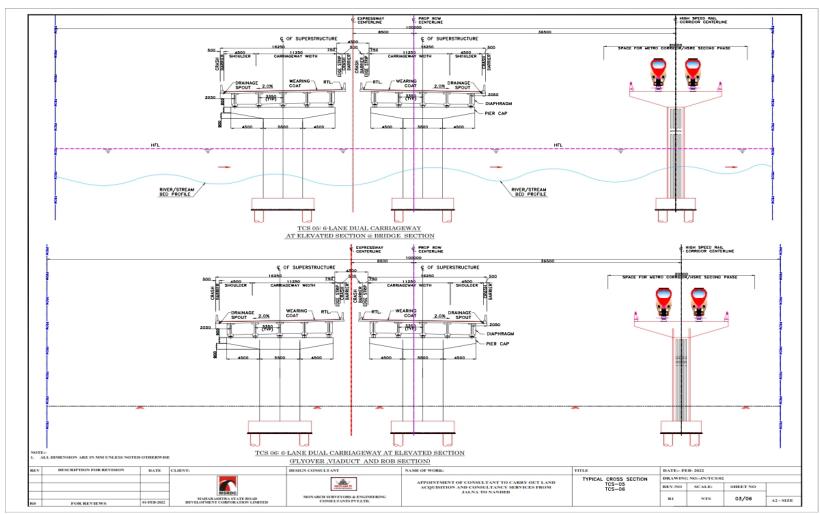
C: (Typ.) Cross Section of Proposed Alignment
